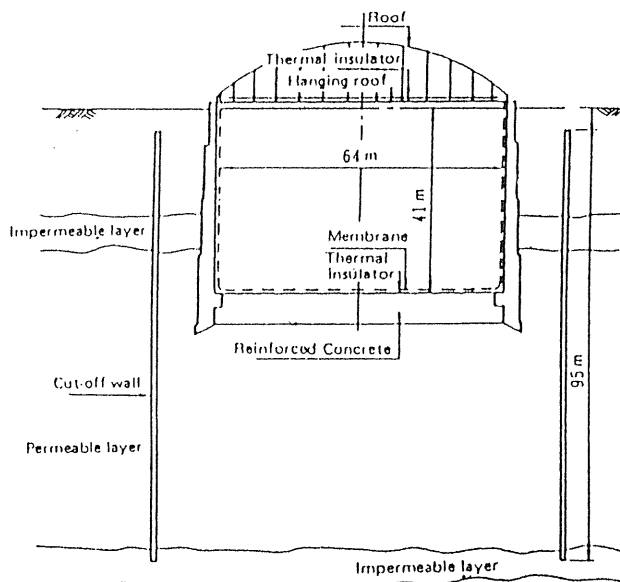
Typical cross section of underground liquefied gas storage tank.
